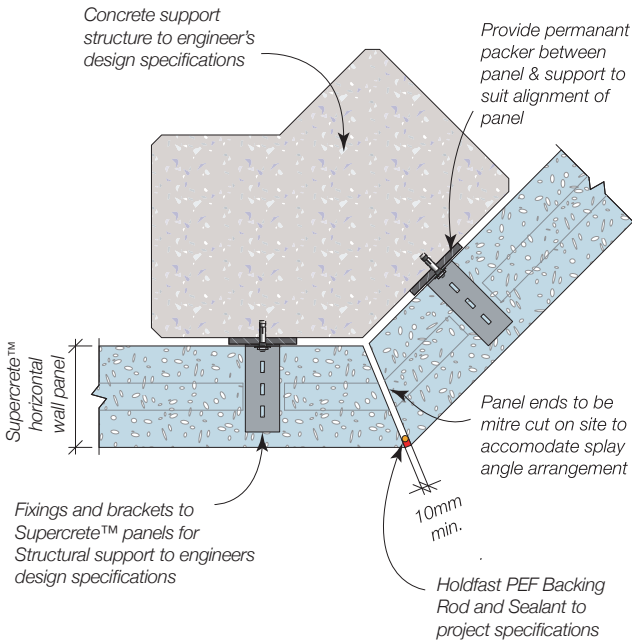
Horizontal wall panel & concrete support - corner junction detail.
